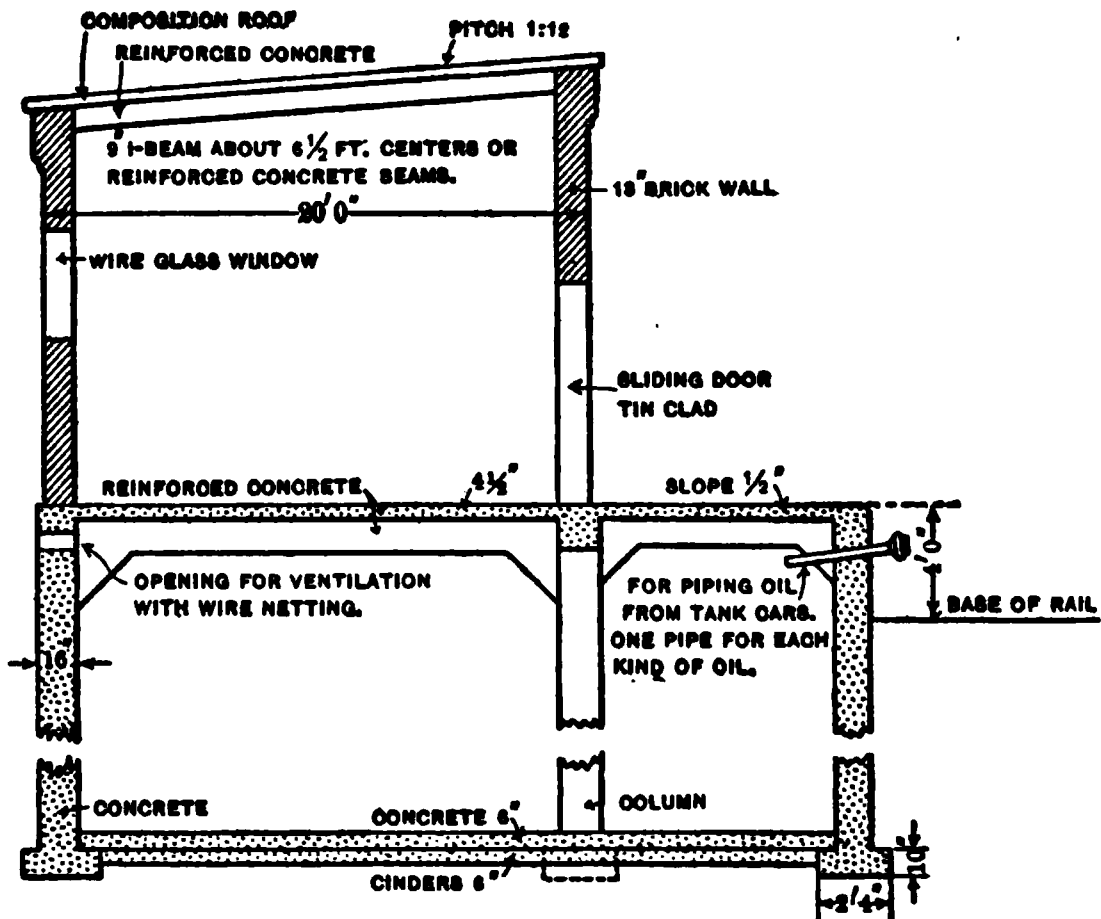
CROSS-SECTION OF TYPICAL OIL-HOUSE.
